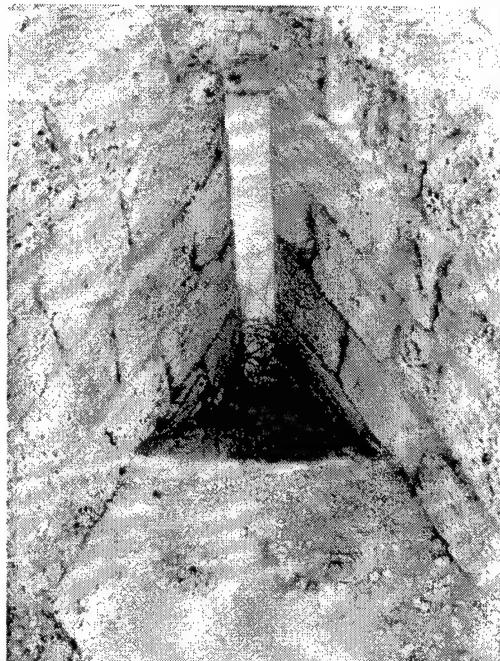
Arrow Slit Inside Archer's Loophole. (View east from interior of projecting tower). Sloping bottom surface allowed trajectory to base of the wall.
